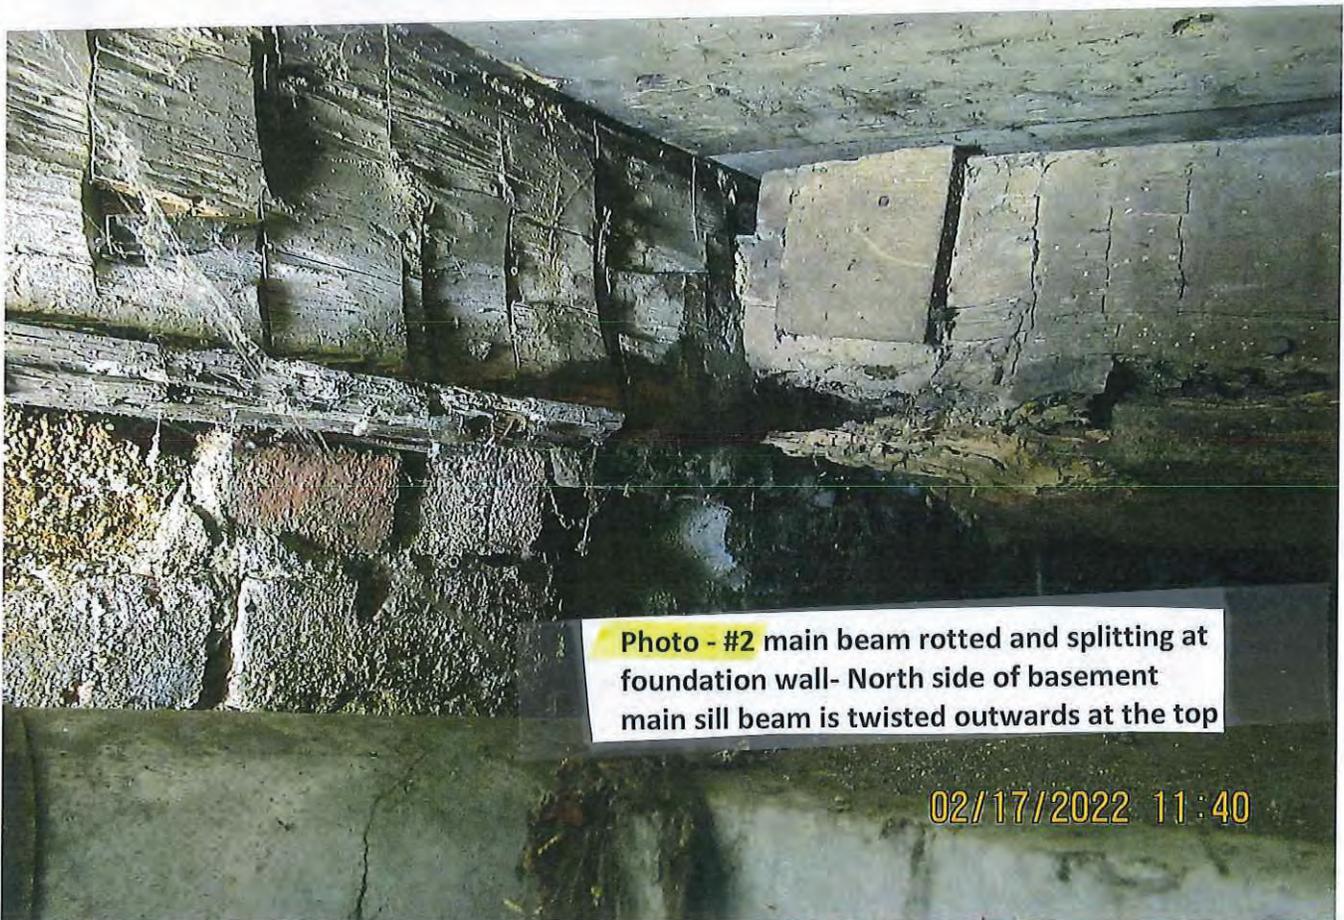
main beam rotted and splitting at foundation wall- North side of basement
